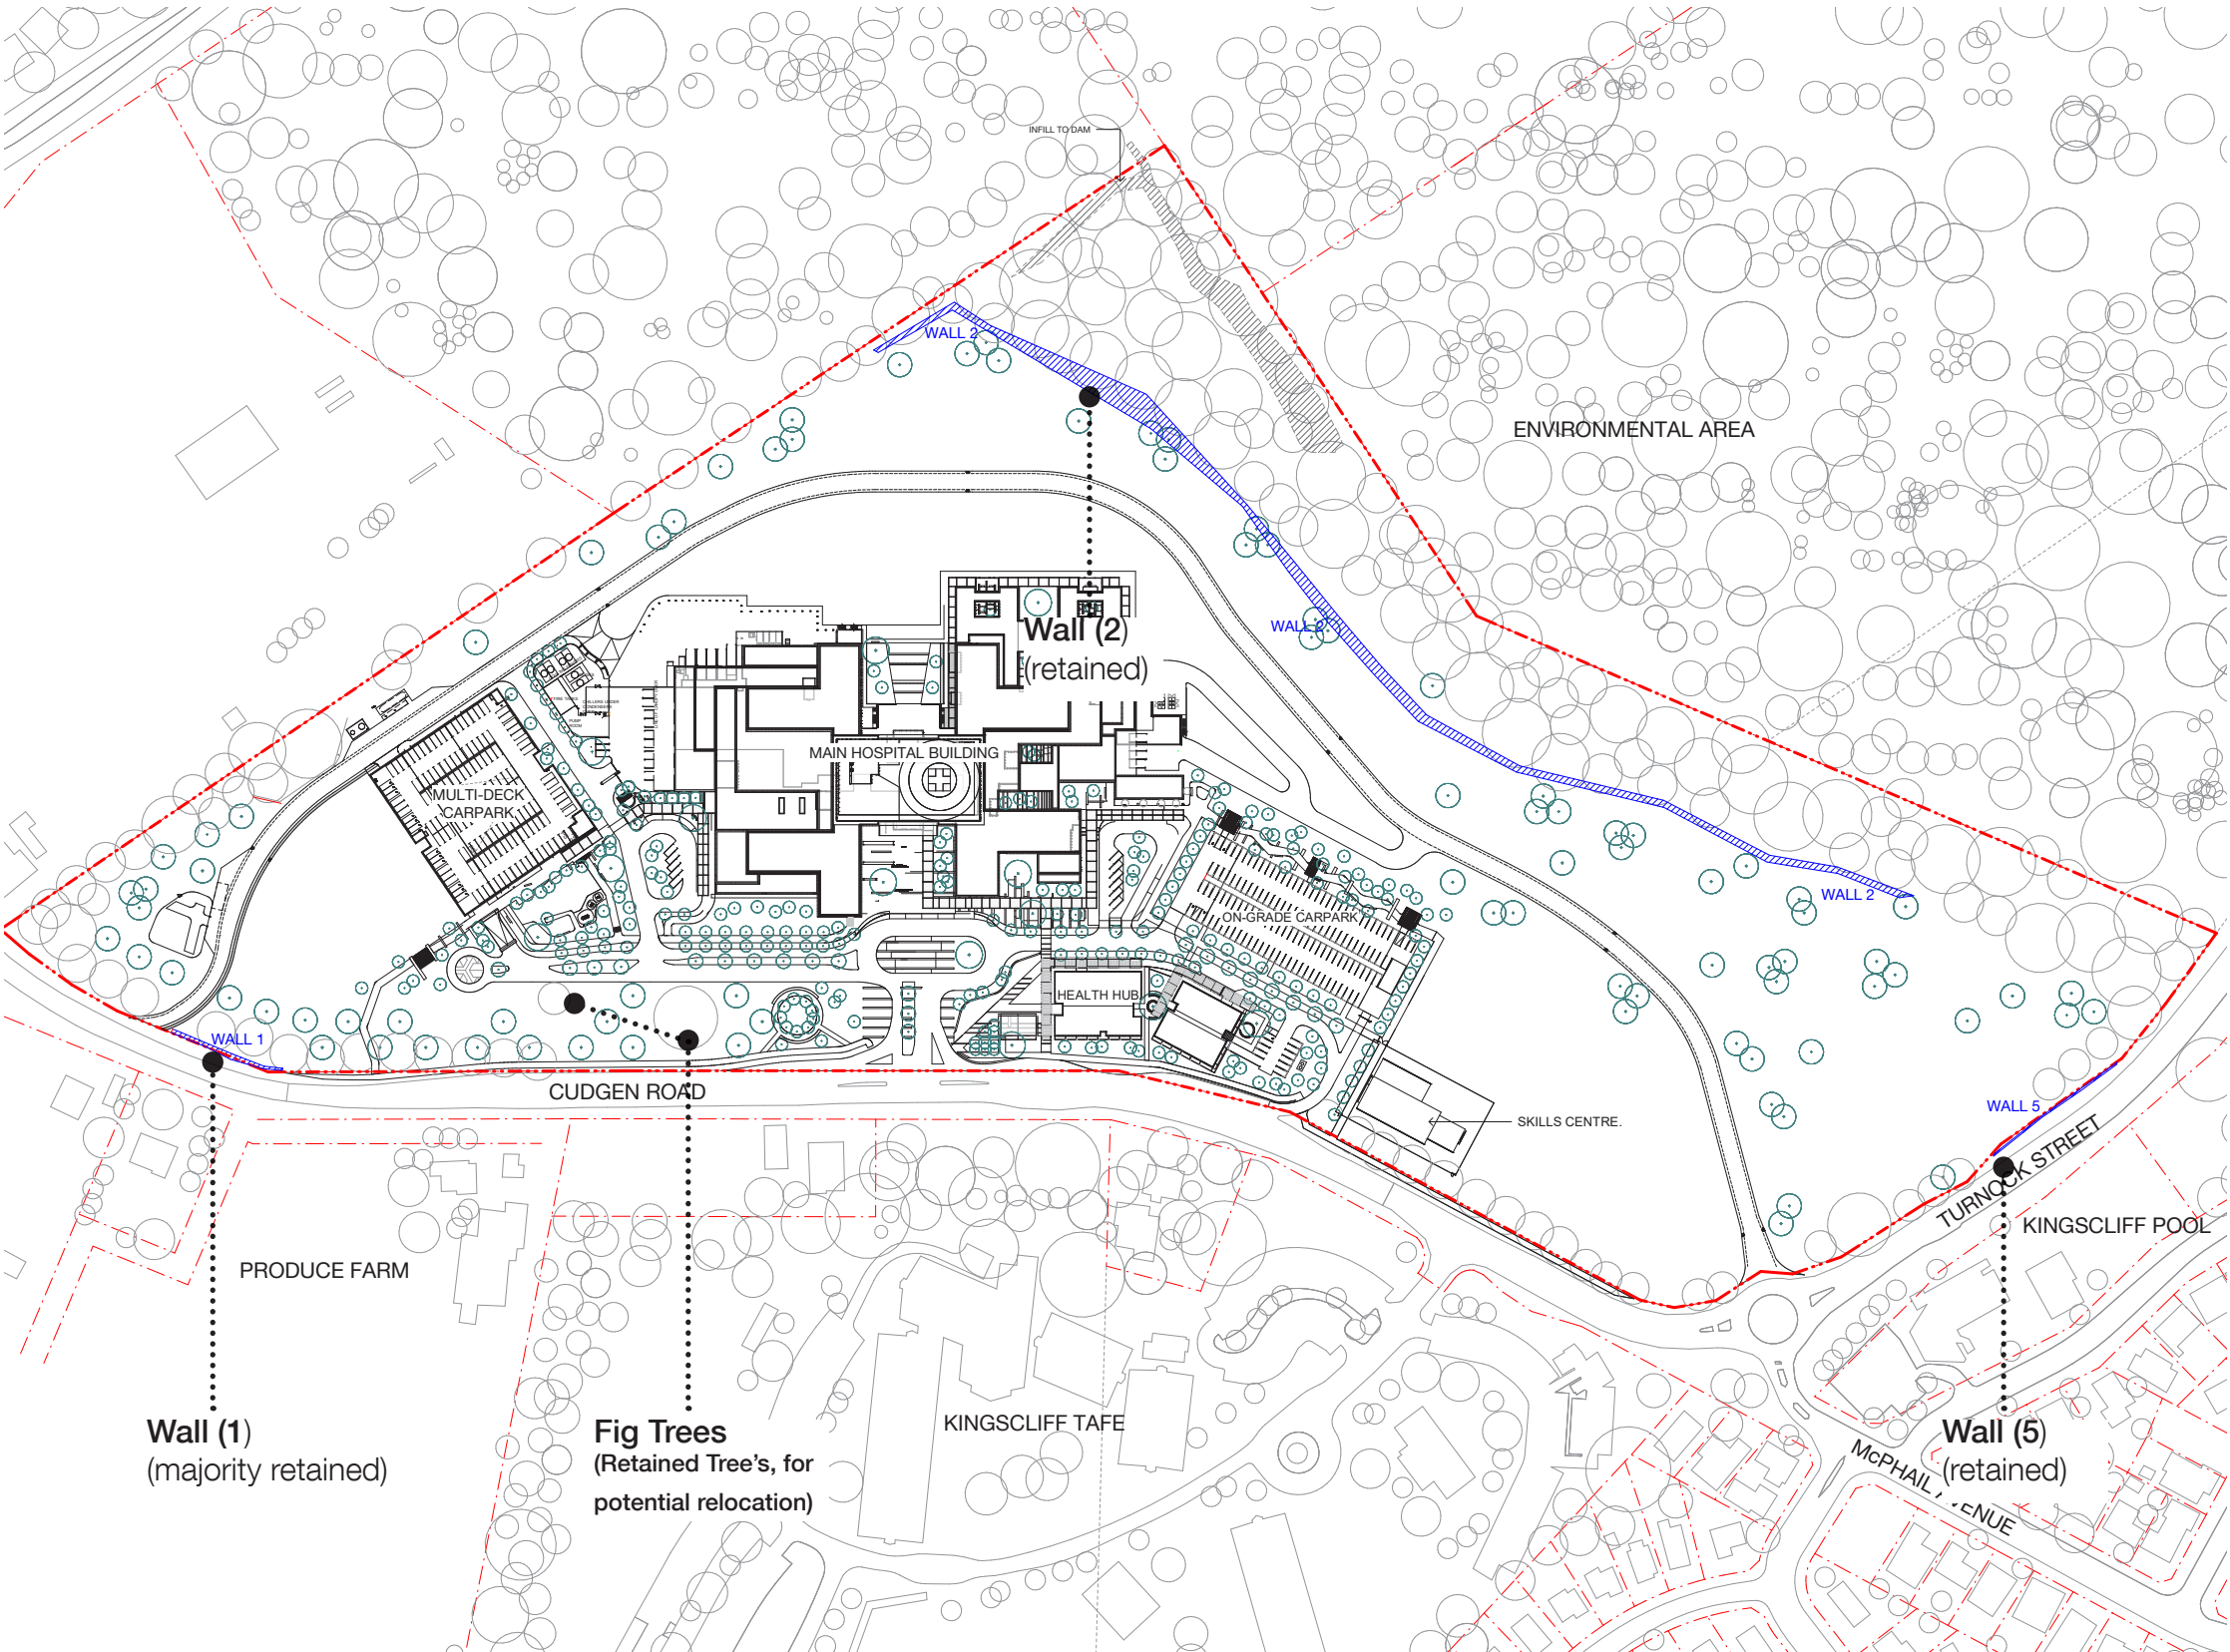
Site Plan - Proposed Development, Heritage Wall Overlay
